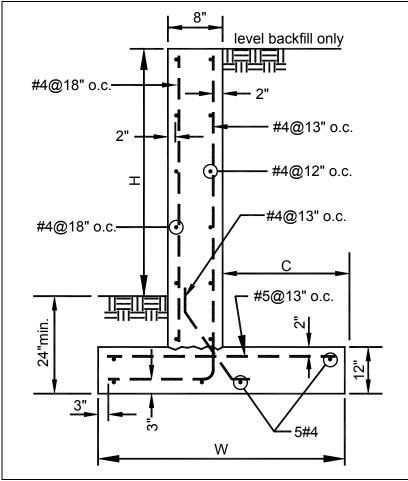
TYPICAL CONCRETE WALL SECTION
